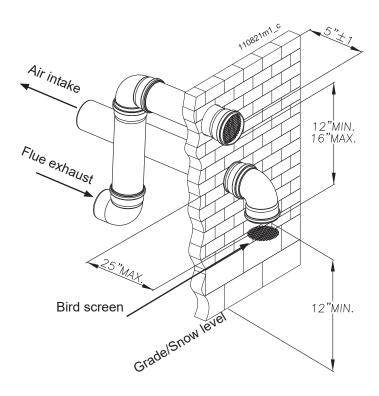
Two pipes sidewall termination of air and vent (if space permits)
